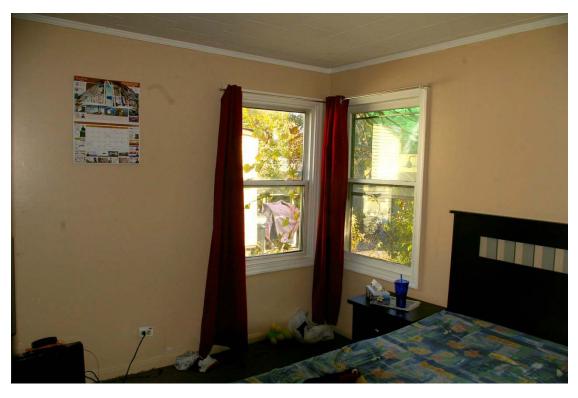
Back bedroom looking towards the east corner of the house with windows on the side and rear walls (original openings and frames).
